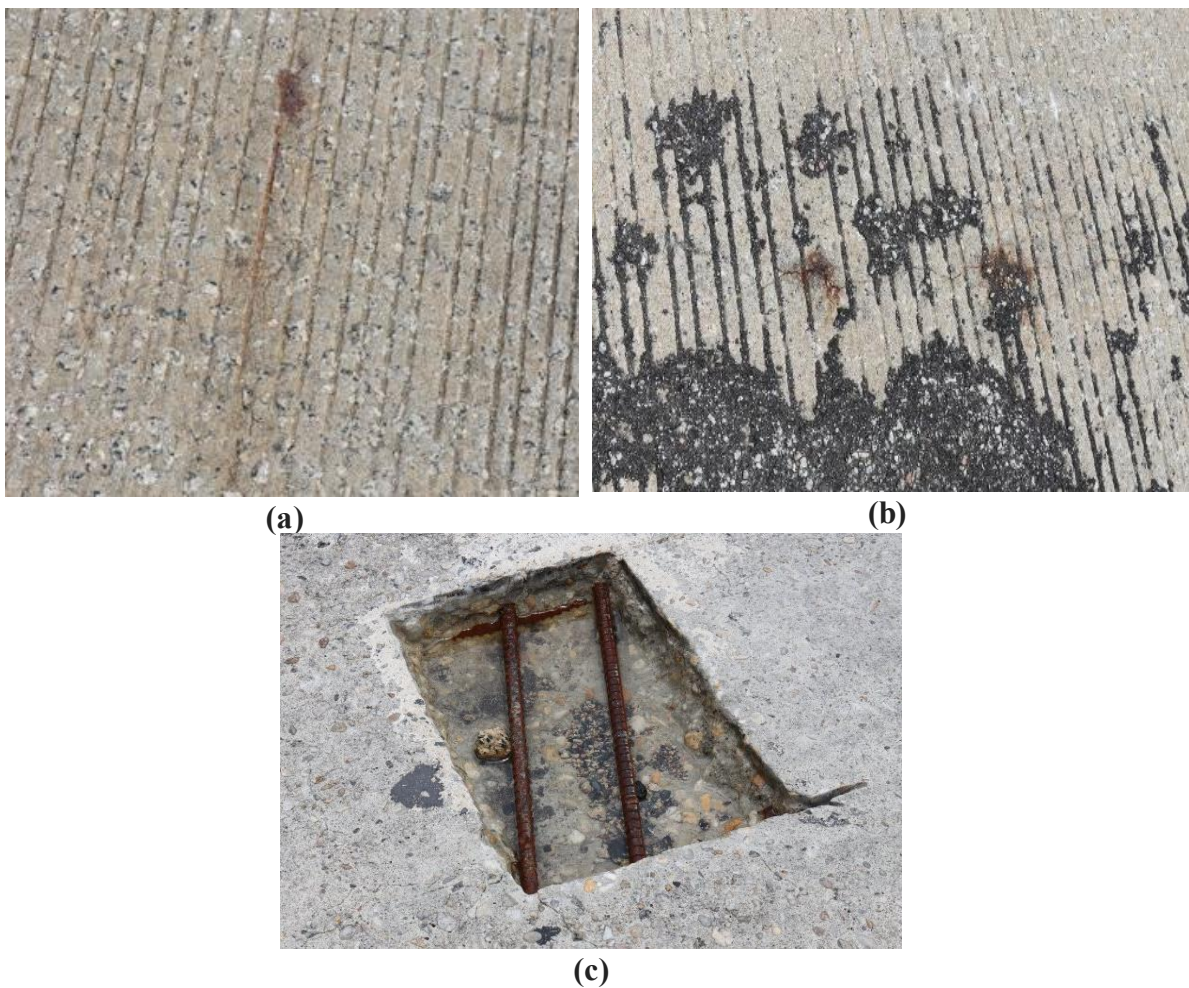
(a) Corrosion through Pavement Surface (b) Corrosion Adjacent to Patched Section (c) Section to Expose Corroded Rebar
